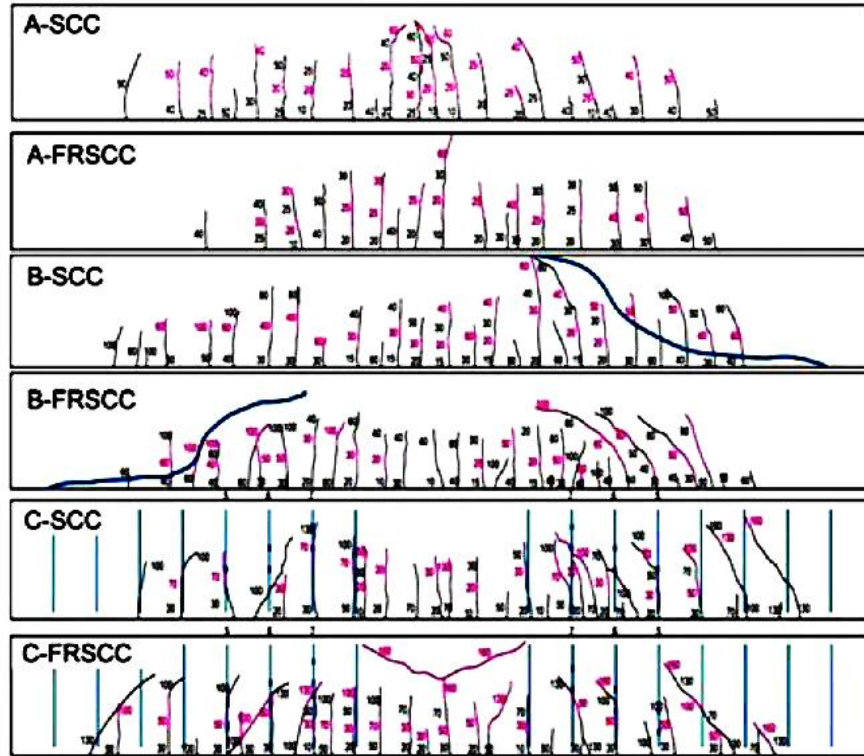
Crack pattern and loading levels on beams (Fritih *et al.* 2013)
